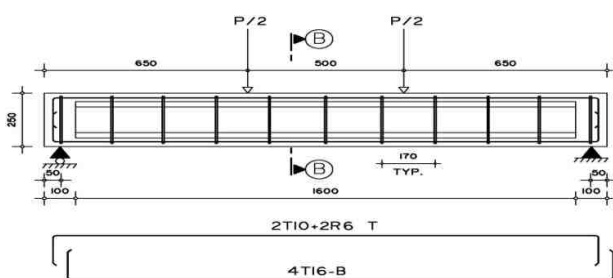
CONCRETE DIMENSIONS OF BEAM SPECIMENS
